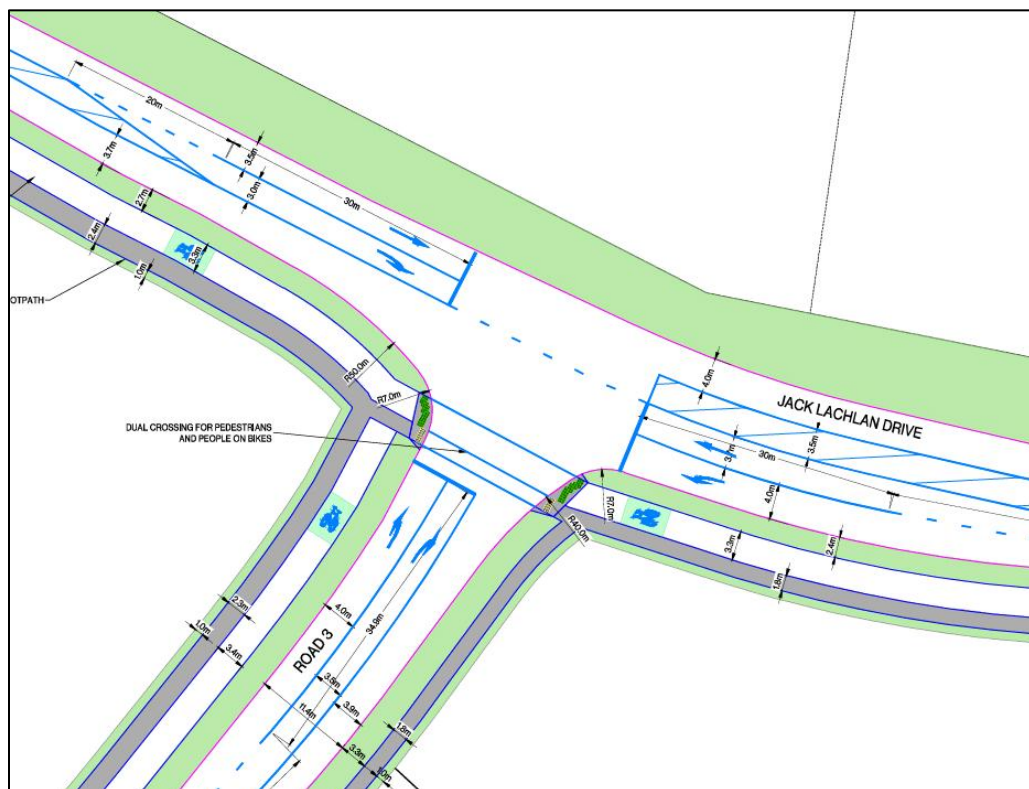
Road 3 / Jack Lachlan Drive intersection
